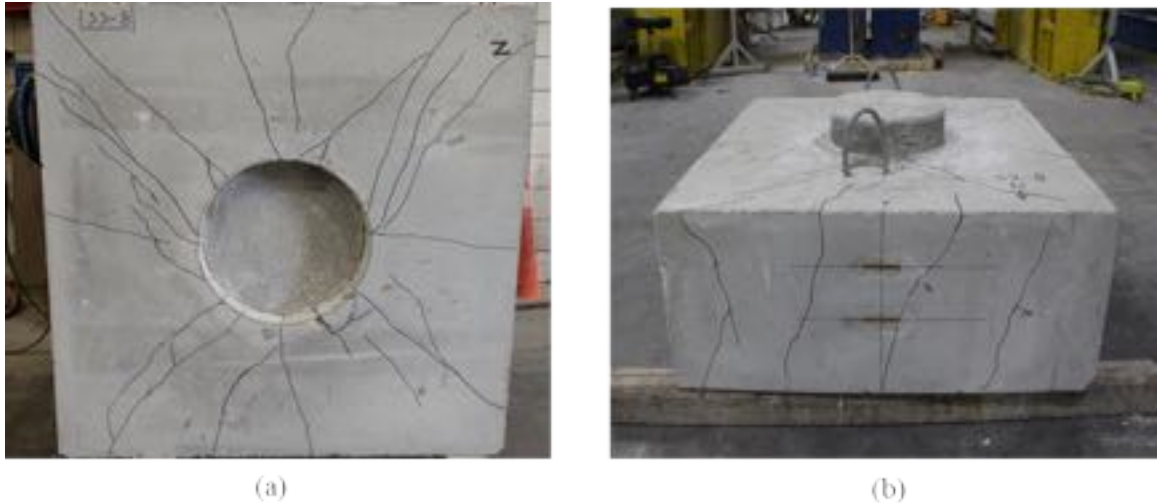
Cracking on (a) bottom and (b) cap of Specimen S3-8
